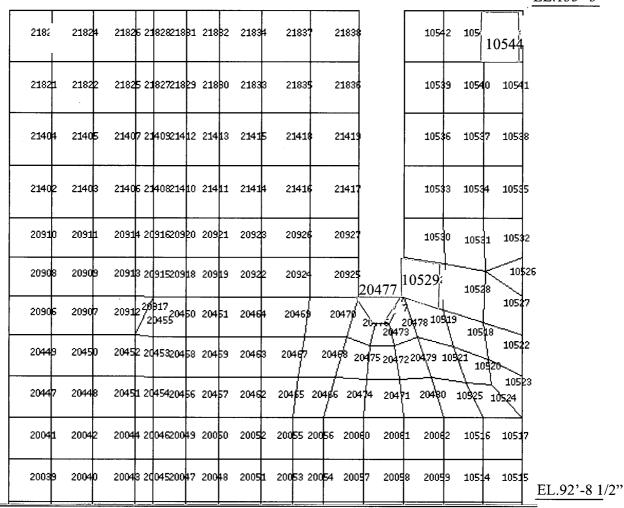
Spent Fuel Pool Wall Divider Wall Element Locations
